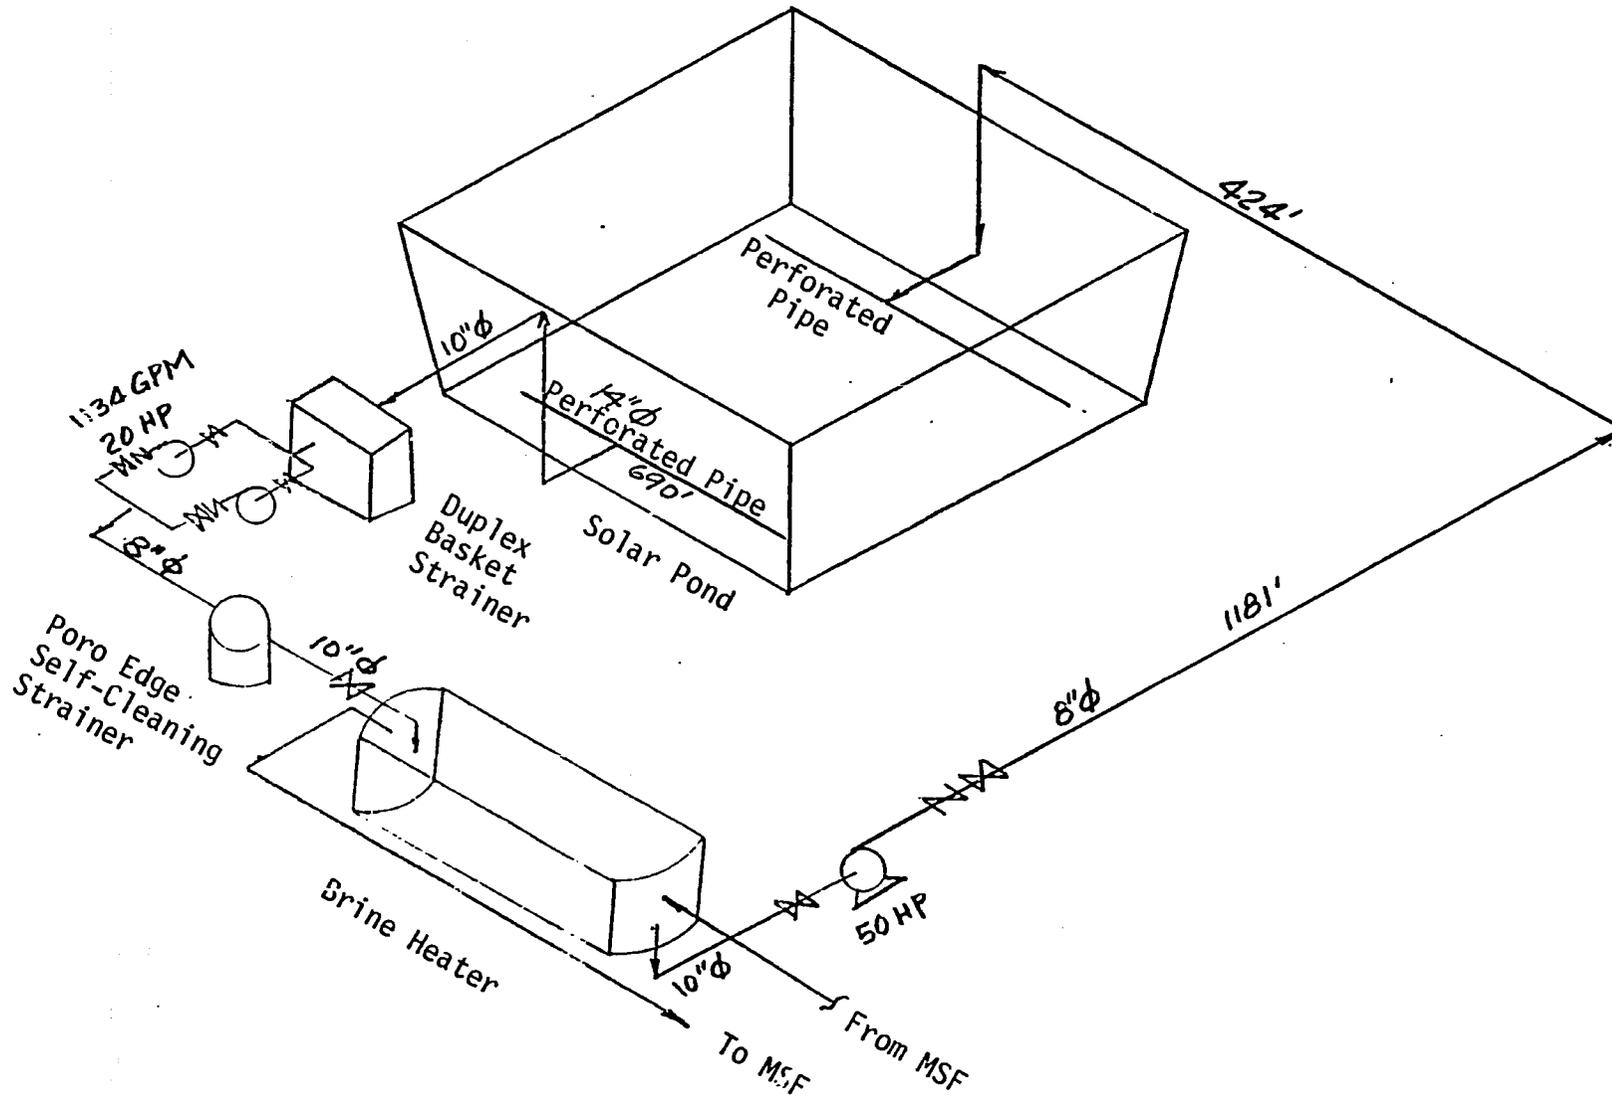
SALT GRADIENT POND PIPING AND EQUIPMENT AT MSF - PR8
